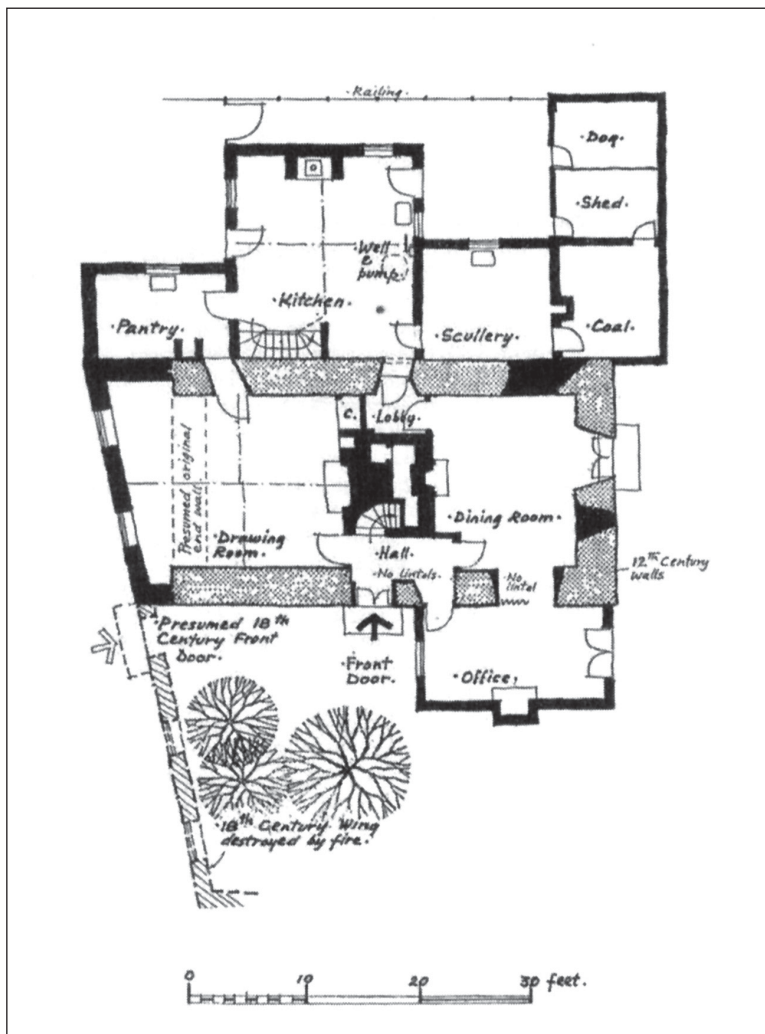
Plan of the ground floor in 1938, before alterations (Peter Boston).
